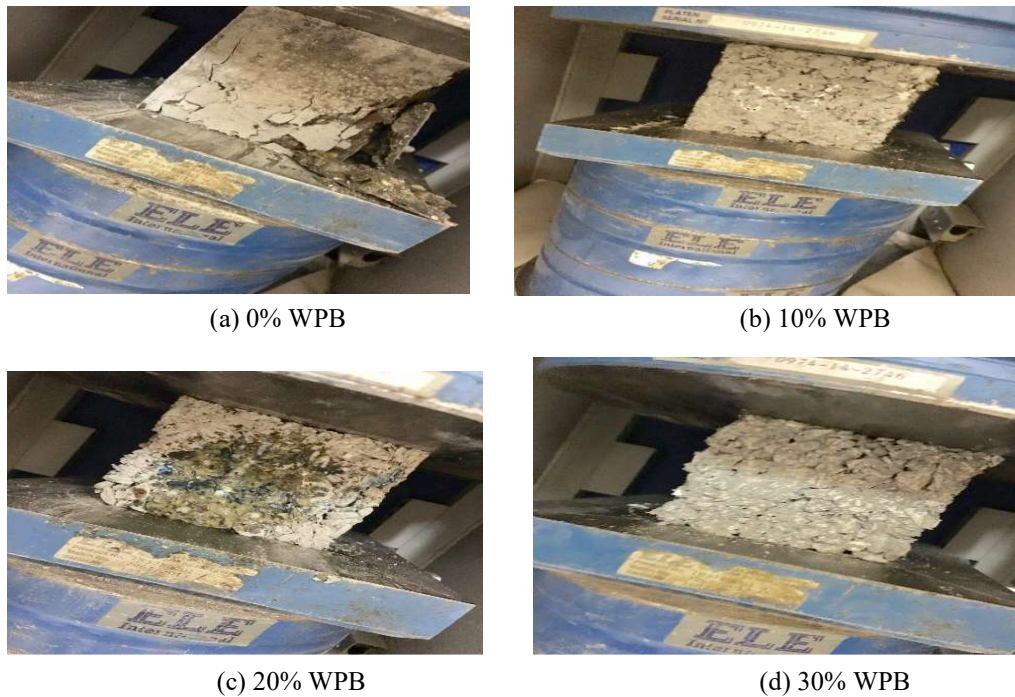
Typical failing manners for concrete samples with various contents of WPB under compression
